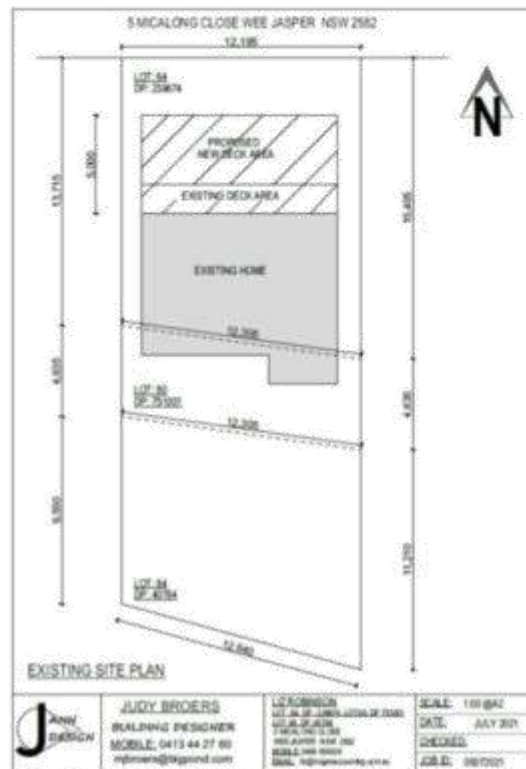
Proposed Site Plan (Source: J ANN DESIGN, 2021)
